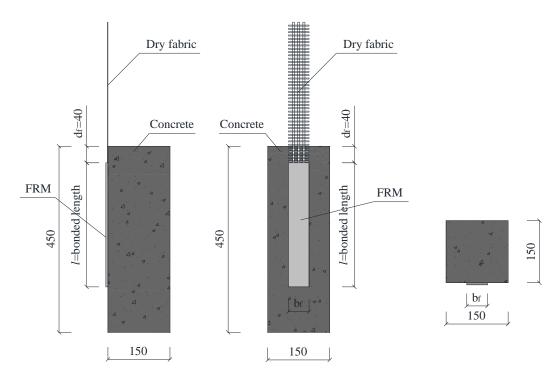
Specimen Dimensions and Details of Bonded composite system (concrete specimens).
